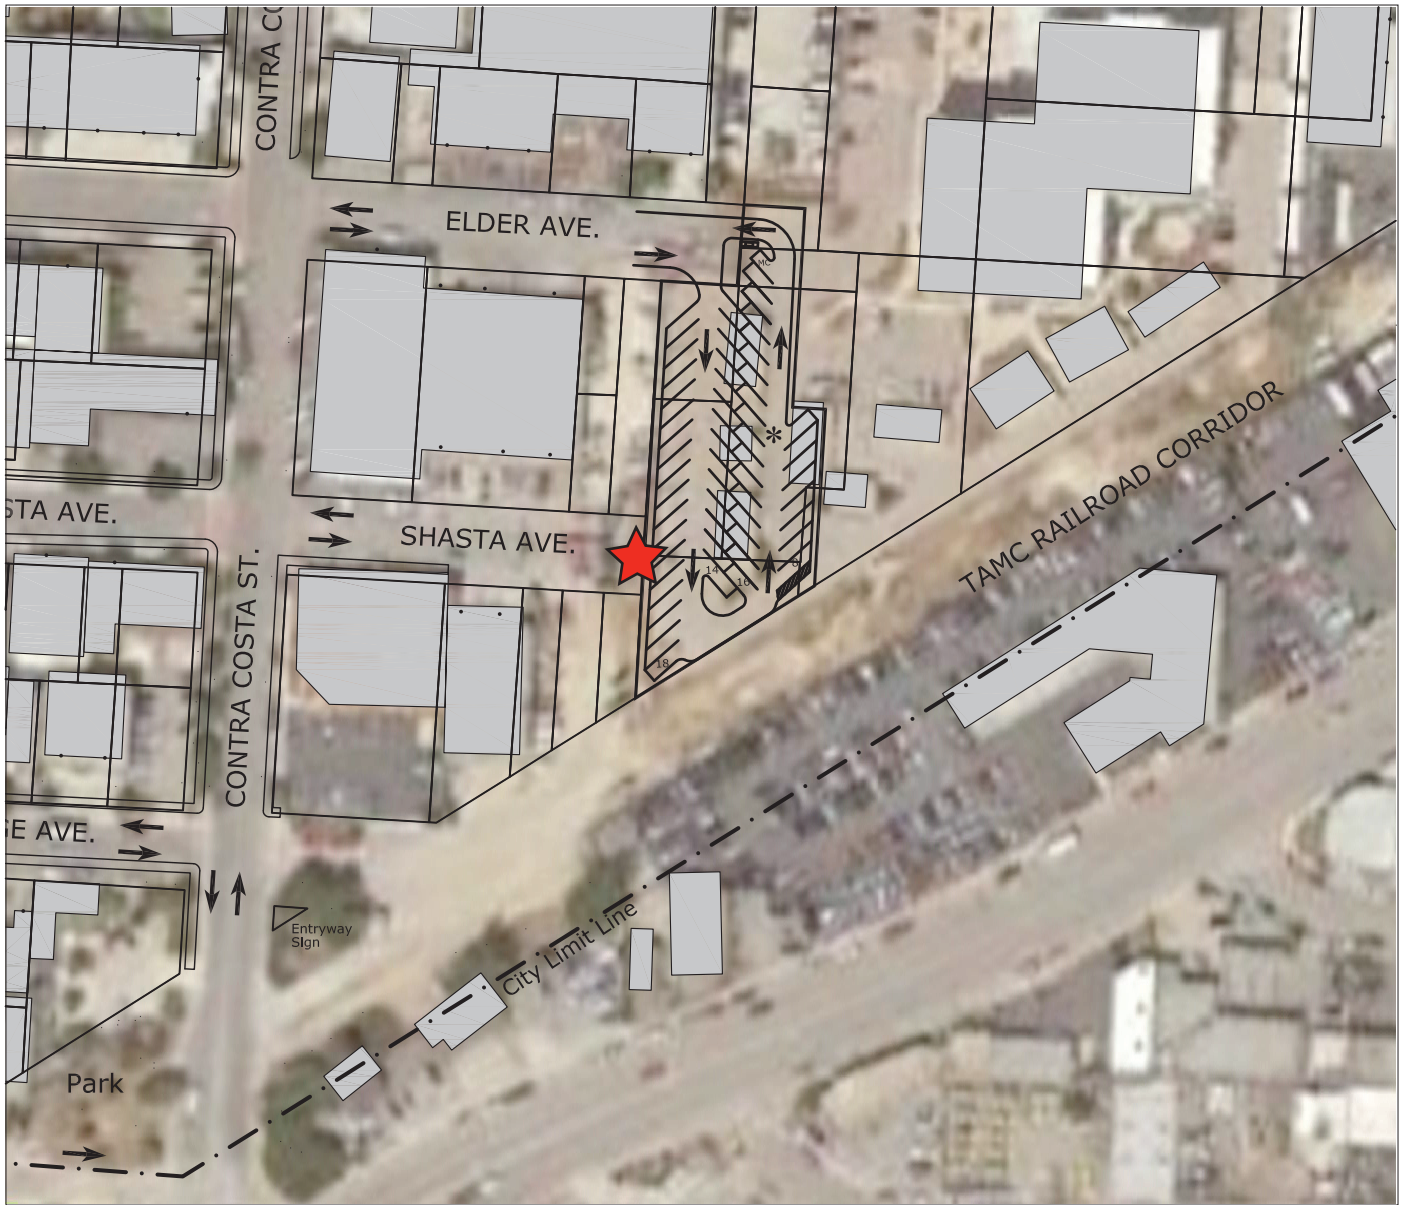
B, *Independent/TAMC Corridor Deck Parking*, shows potential parking availability if an additional parking deck was added over the TAMC rail corridor and MST bus lanes as an extension of the parking deck illustrated in Figure 5-3A. A parking deck over the TAMC rail corridor would be most efficient in conjunction with a City deck in The Independent air space, because it would take advantage of the grade differential at Elder and/or Shasta Avenues. The Independent deck would accommodate up to 59 standard parking spaces (including one standard accessible space) and two motorcycle spaces in this concept; and the TAMC corridor deck could potentially accommodate 59 spaces with elevator access to the ground level below. Together, The Independent parking deck and the TAMC parking deck could conceivably provide a total of 118 parking spaces. This concept would require construction of the parking structure and improvements to Elder Avenue. A second or alternate access point could also occur on Shasta Avenue (not illustrated), which would reduce the number of potentially available spaces by about six to eight spaces. The ultimate size of the structure would be dependent upon negotiation with TAMC and MST for shared overhead parking in the TAMC right of way. The cost per space for this combined deck concept, as illustrated in Figure 5-3B, would be about \$61,000 per space.
